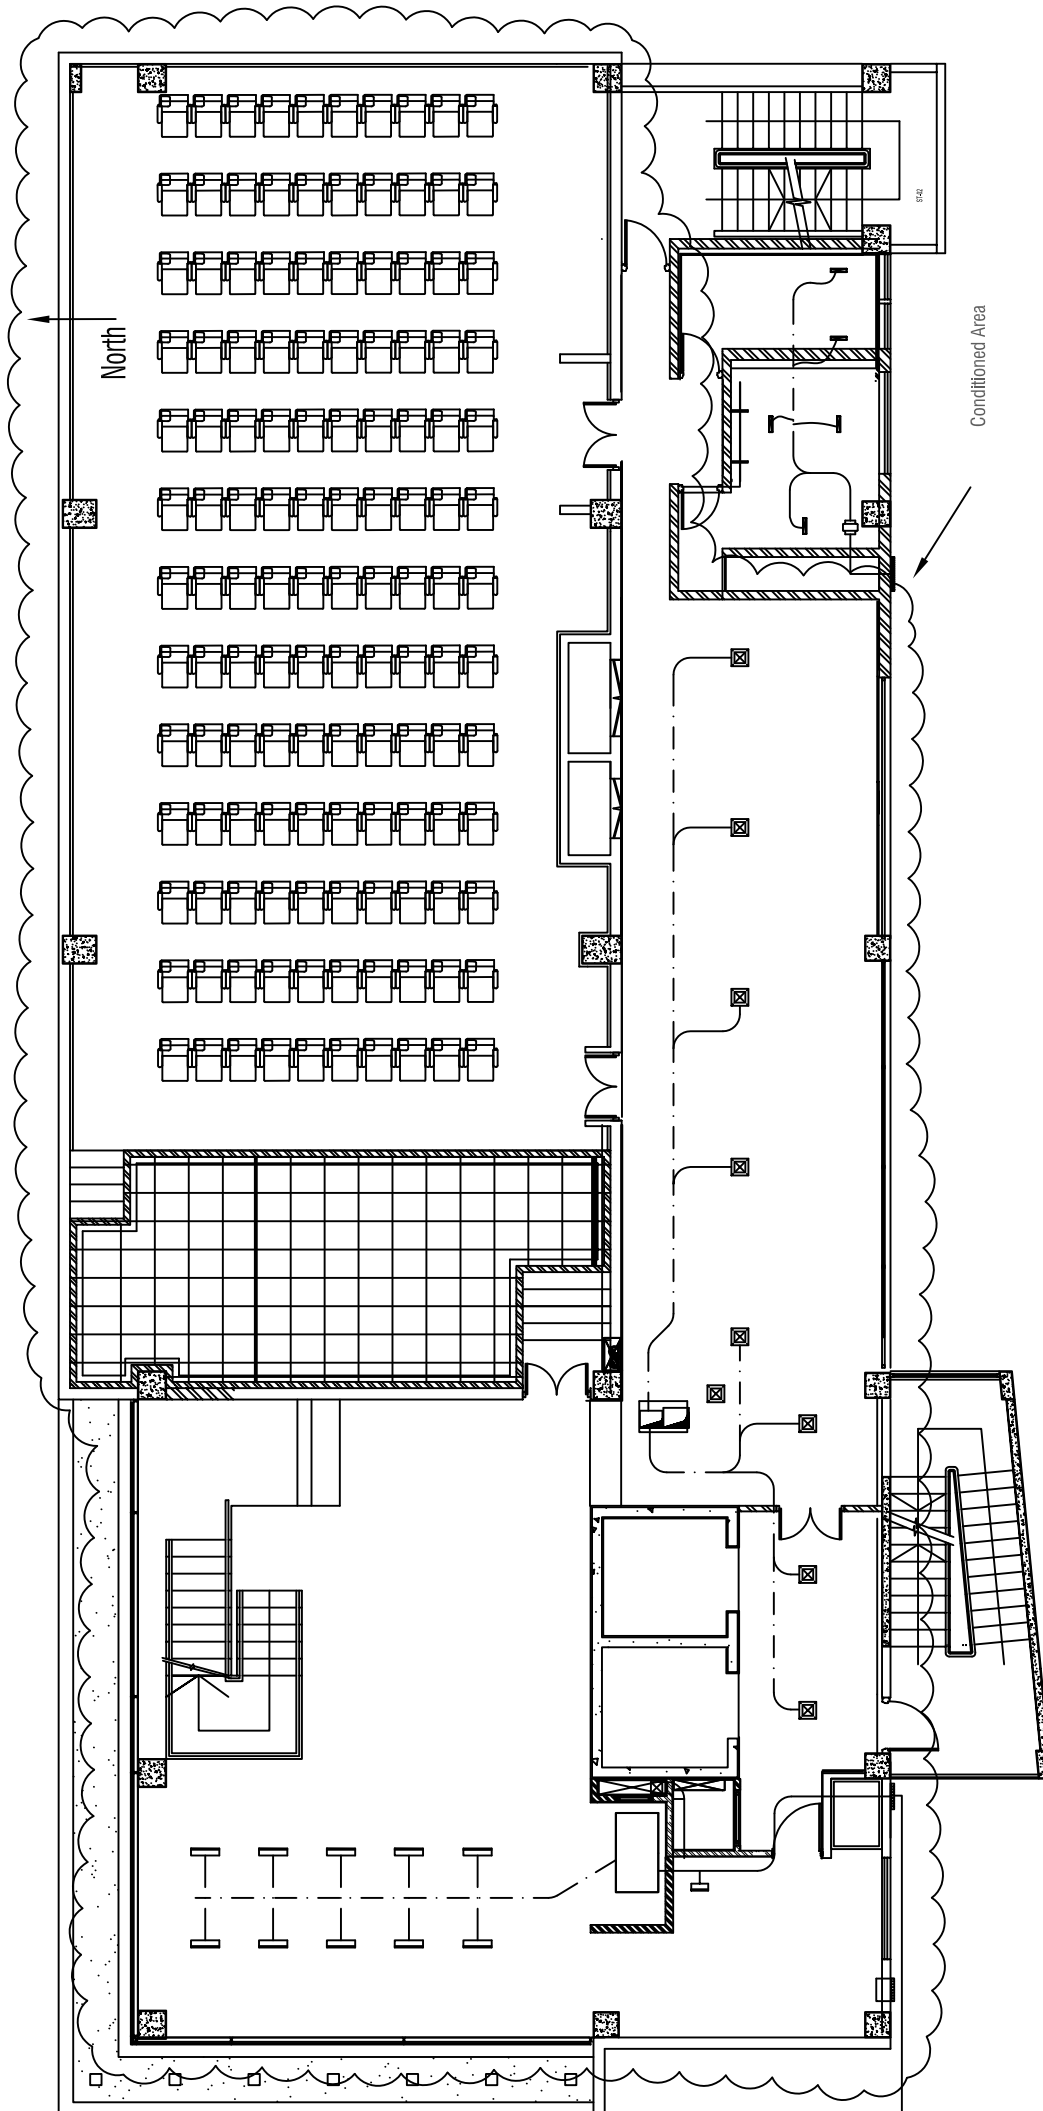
Ceylinco Life Insurance Building - Eighth Floor
